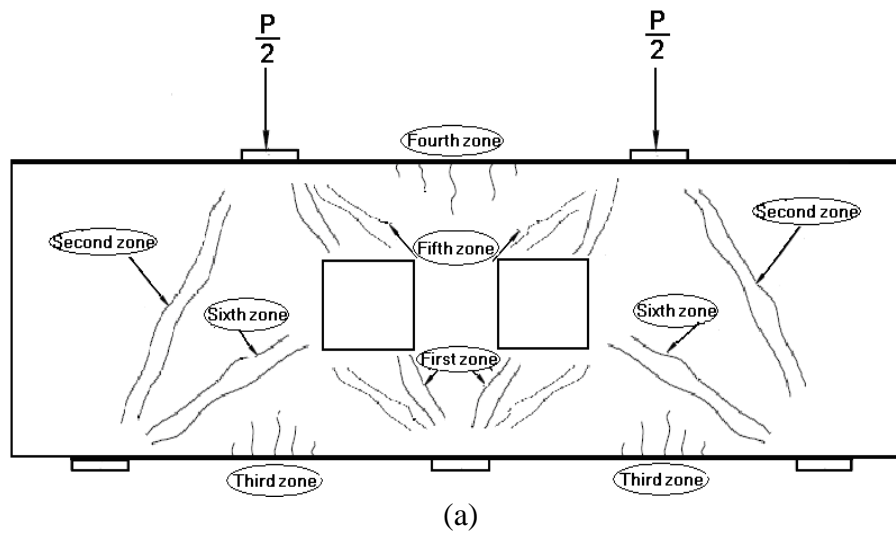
Typical cracking of continuous deep beams with two small square openings and crack pattern of beam HS1
